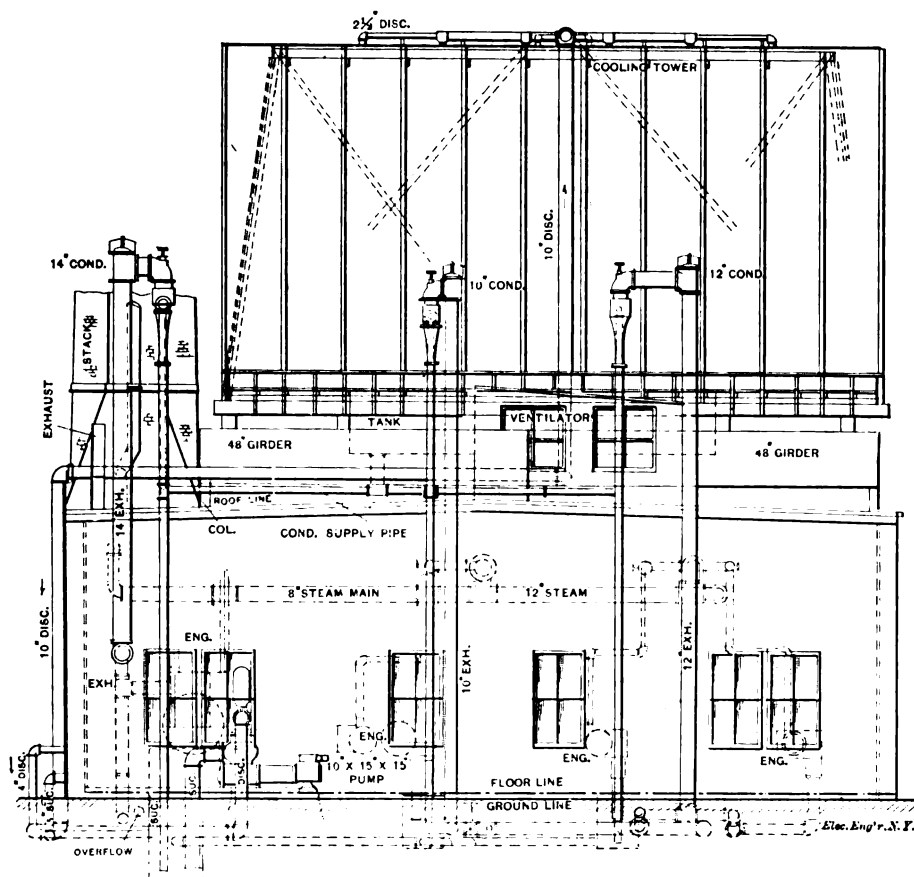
COOLING TOWER AND CONDENSING ARRANGEMENT, HYDE PARK, ILL., THOMSON-HOUSTON LIGHT CO. — SIDE ELEVATION.
